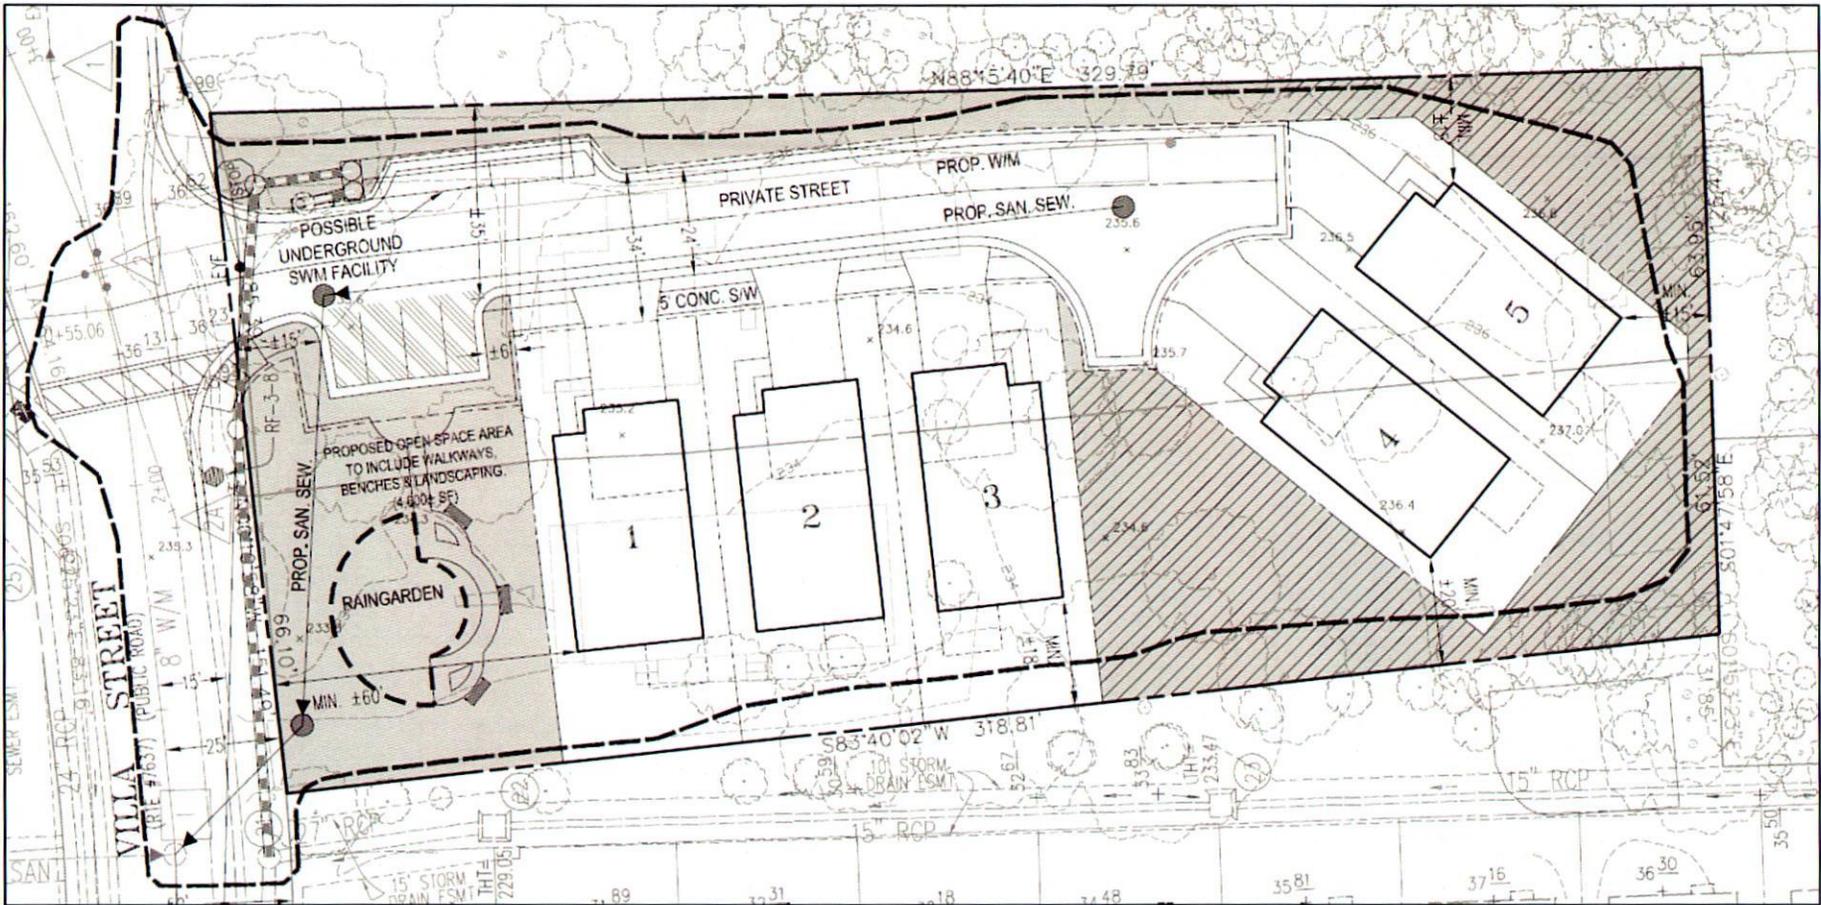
The proposed layout of the site, showing five single family detached dwelling units to the east of Villa Street (Source: Urban, Ltd., 9/24/2012)
